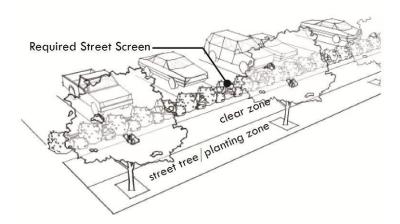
Illustration showing required Street Screen along all frontages with surface parking in the setback zone.
